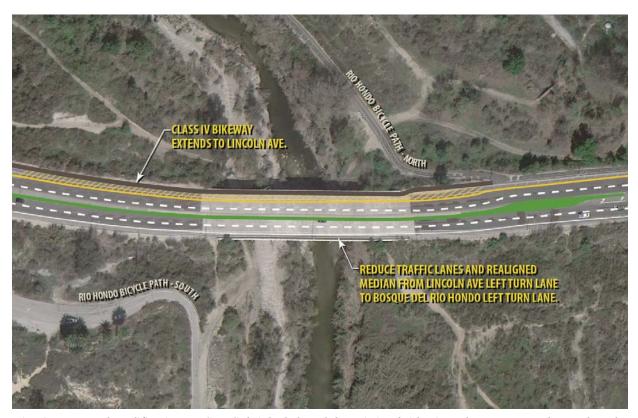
Proposed modifications to San Gabriel Blvd. and the existing bridge in order to connect the north and south portions of the Rio Hondo Bicycle Path.
